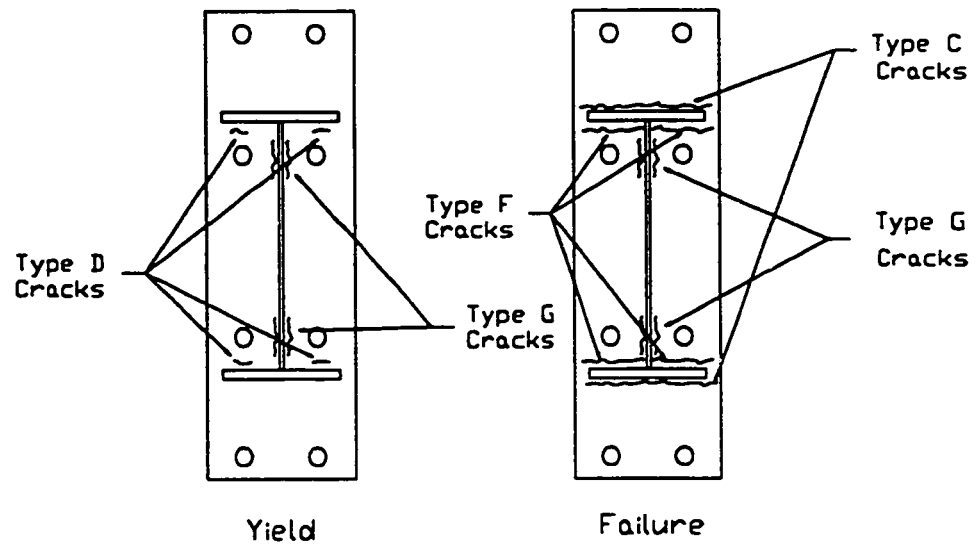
Crack Locations at Yield and Failure for Connection M-2
